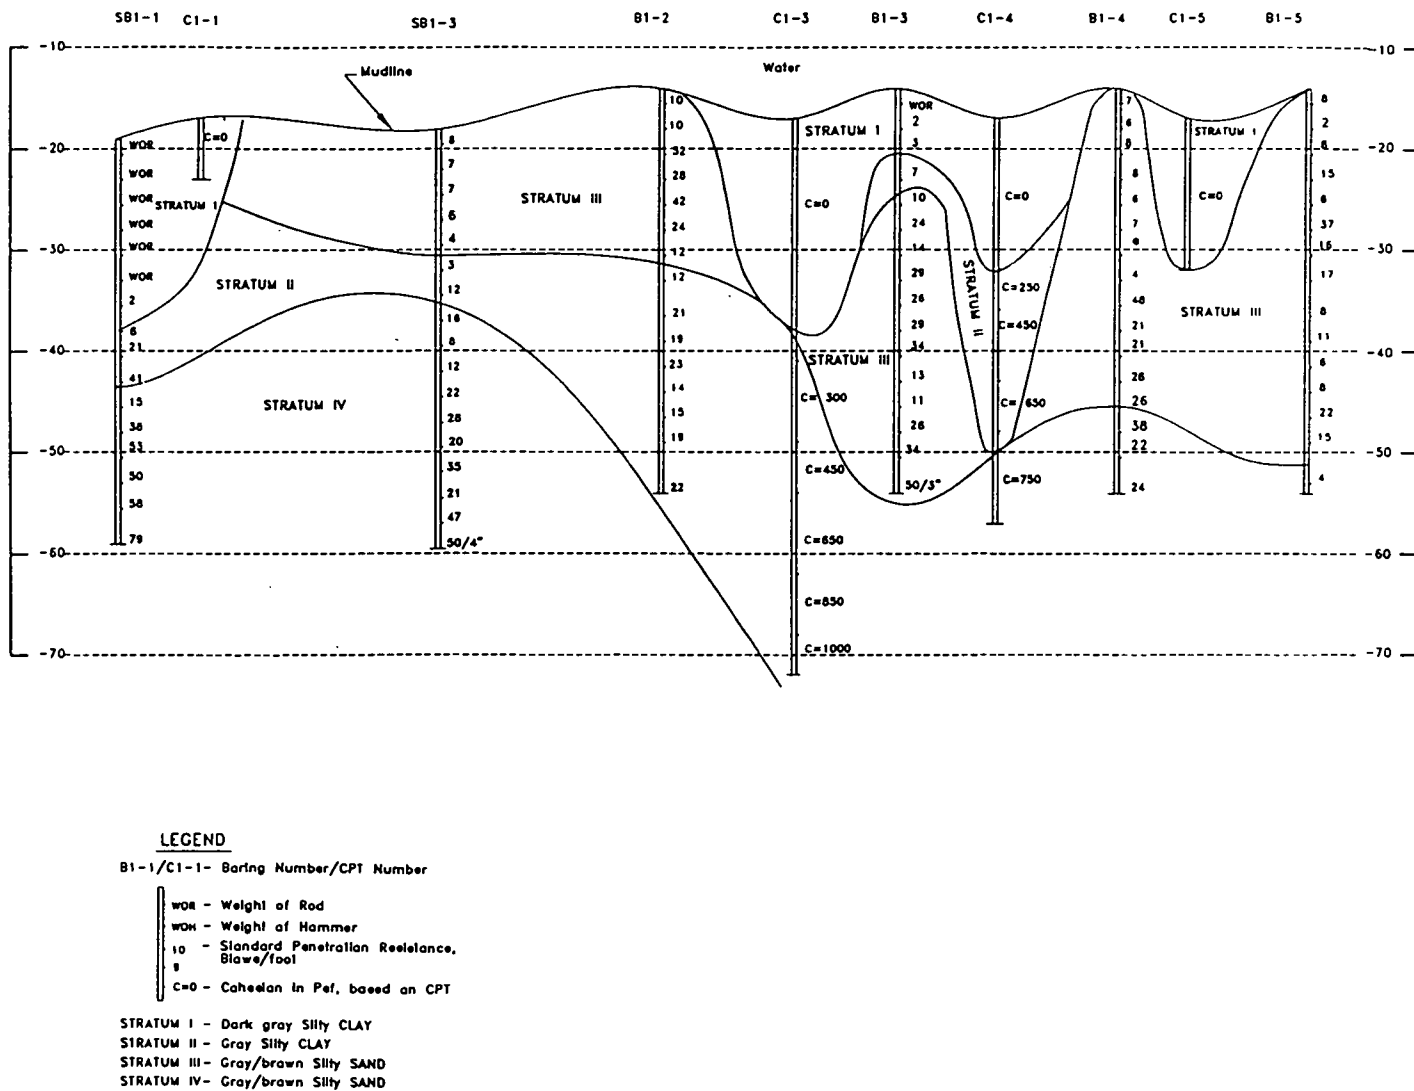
Generalized Subsurface Profile Site 1 - Perimeter
